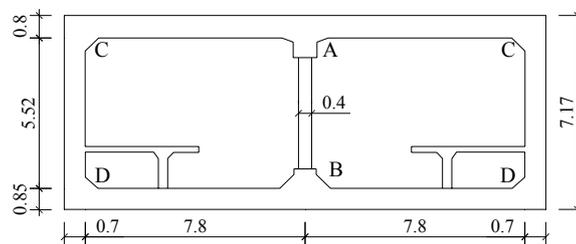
Typical cross section of Daikai subway station (unit: m)
